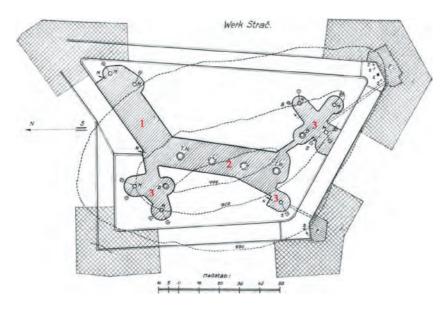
Sketch of the final designs of fort Srač after 1911. 1 – Barracks block. 2 – Howitzer battery. 3 – Machine gun positions for close defence. F – Caponiers. (Source: Pachauer, 2016.)
